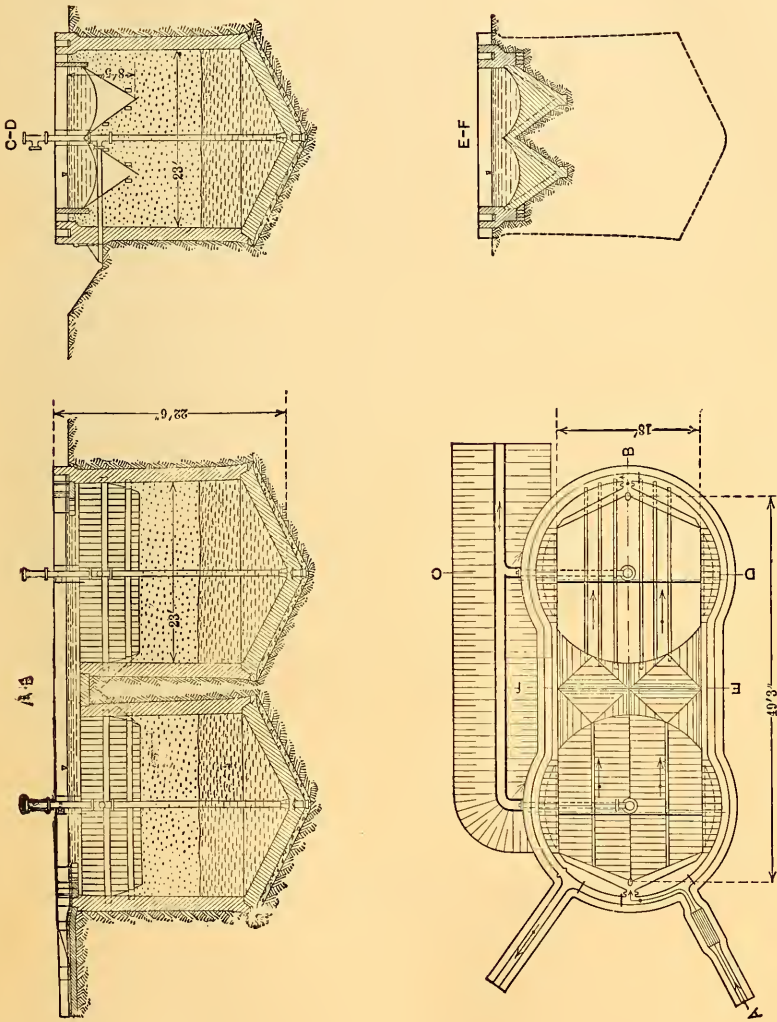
Plan and Section of the Essen Tank (Imhoff, 1909).
